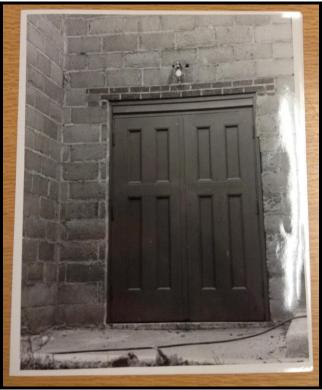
North Elevation Exit, Detail of Easternmost Door, 1947 (Archives of Ontario)
